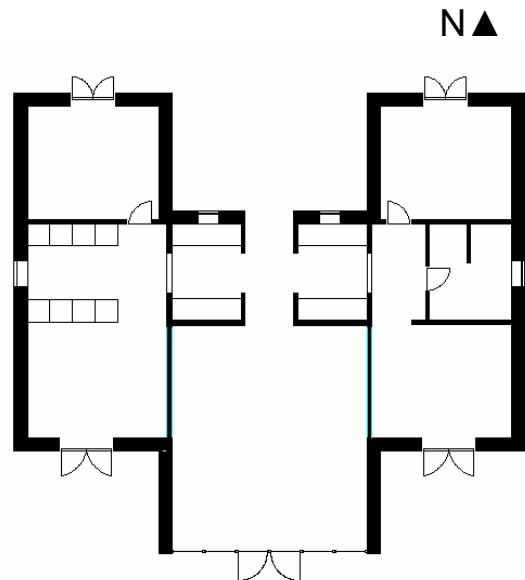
Floor plan of the analyzed dwelling. Not to scale
